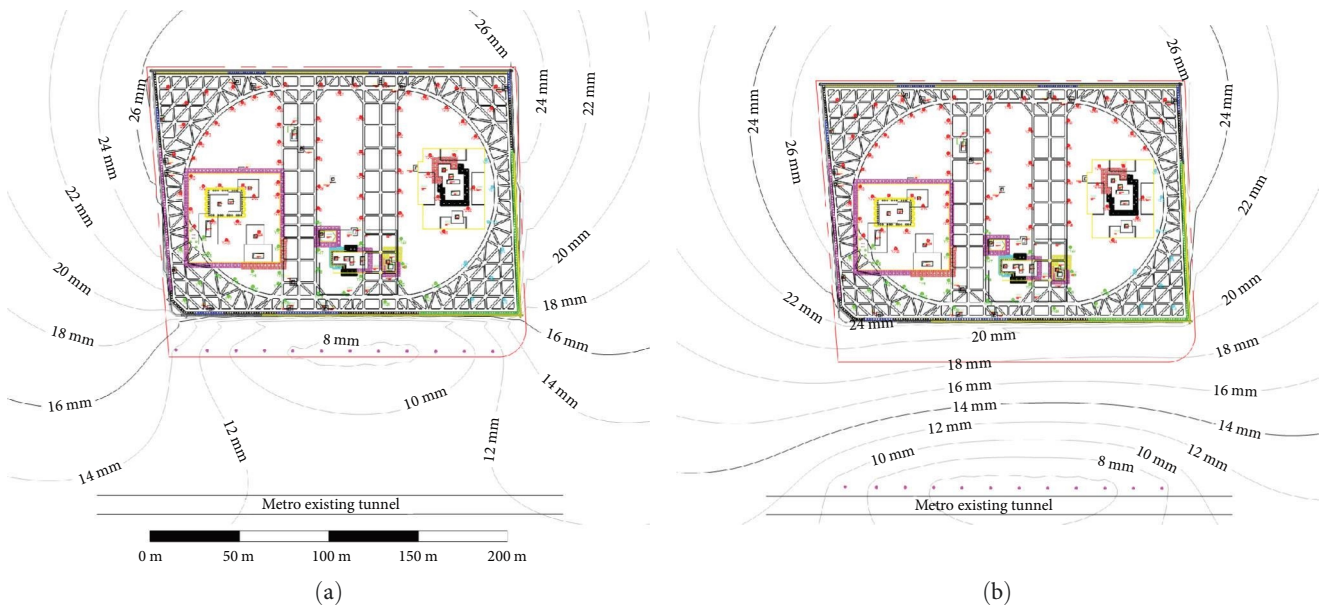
The simulated settlement caused by foundation pit dewatering and artificial recharge groundwater. (a) Recharge wells are arranged within the construction area. (b) Recharge wells are at the metro existing tunnel.
